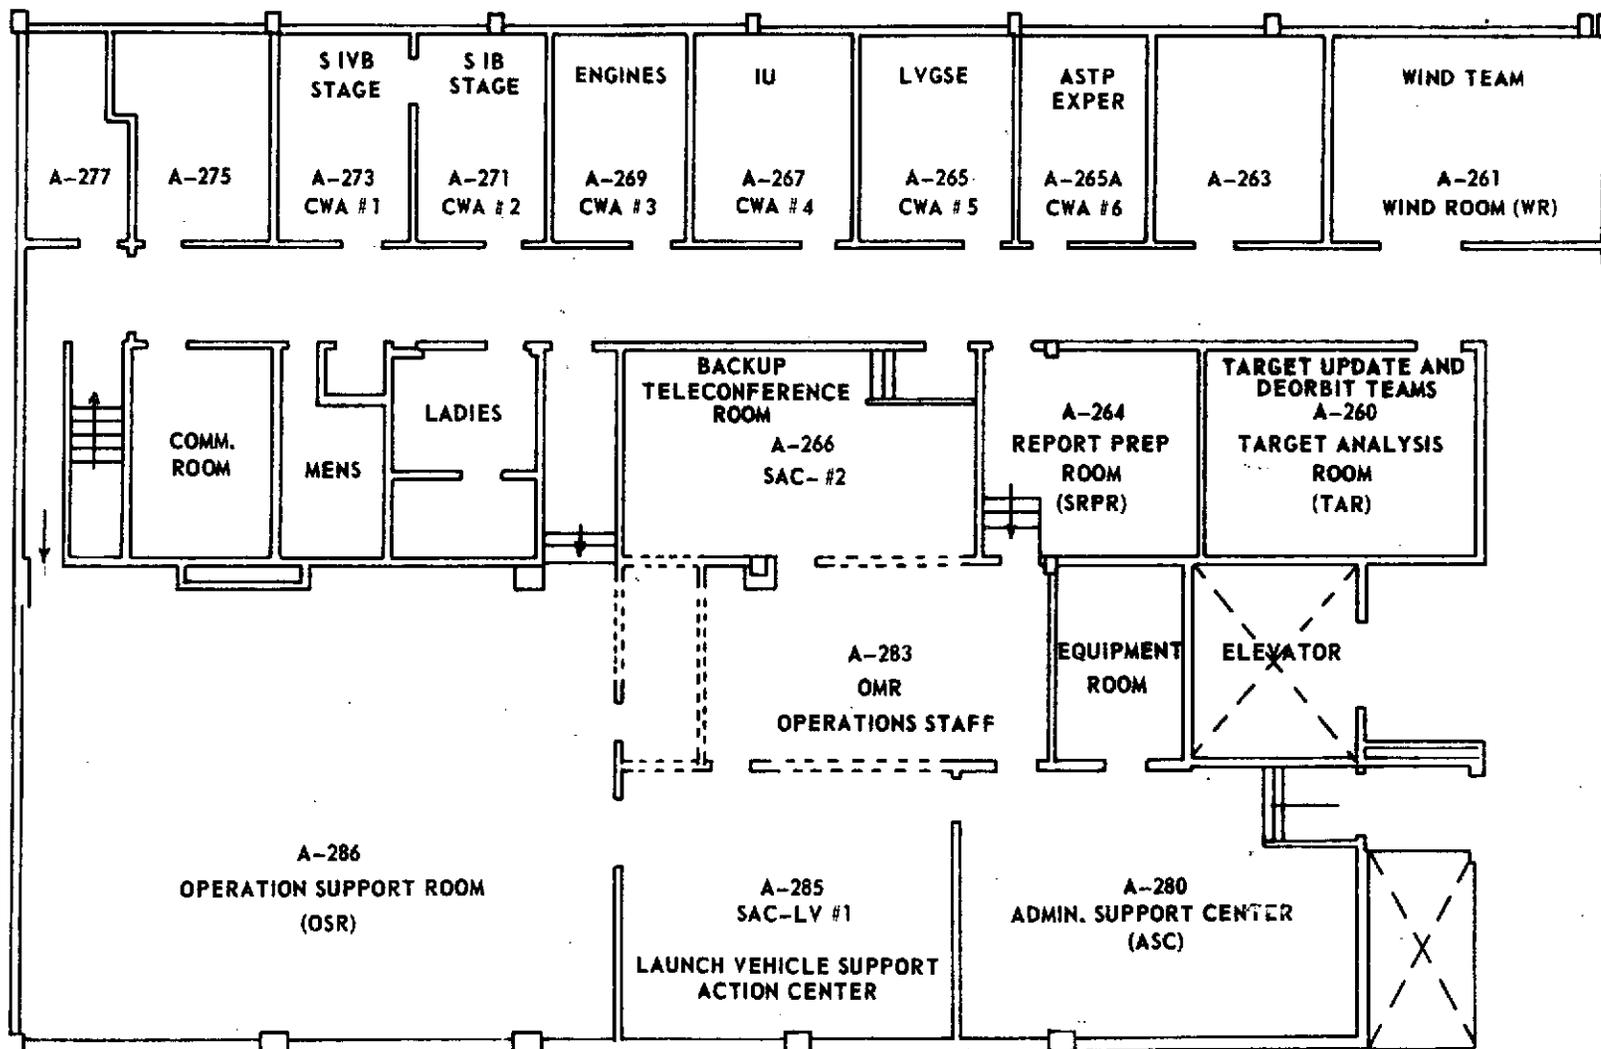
HOSC FLOOR PLAN (SECOND FLOOR)
